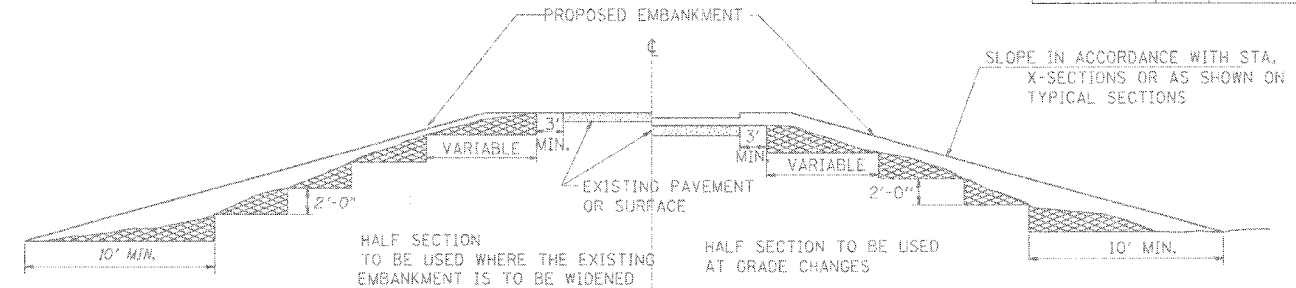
DETAIL OF SLOPE TO NATURAL GROUND TRANSITION
